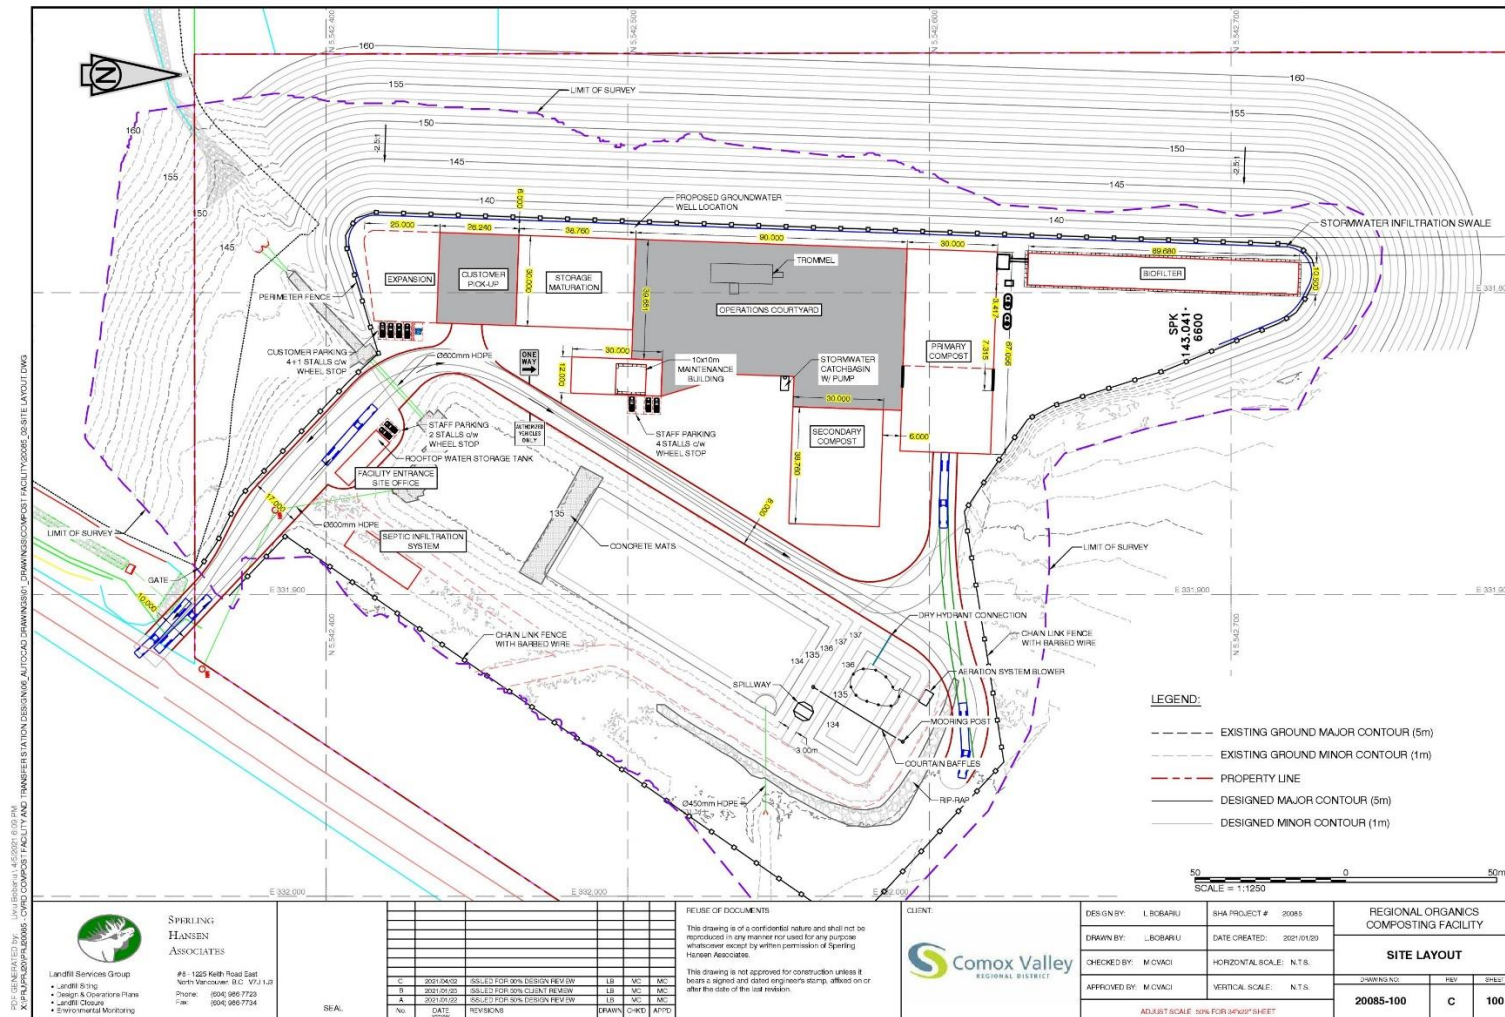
Proposed site plan for the development of a composting facility at 6300 Argonaut Road, Campbell River.
